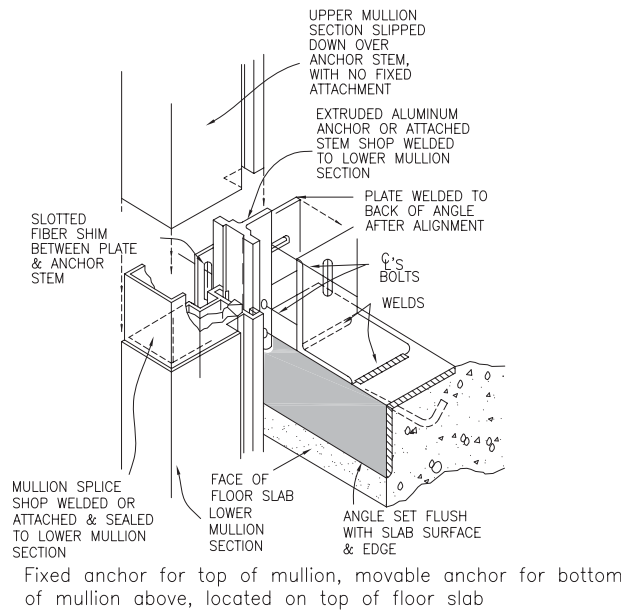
Mullion connection on top of floor slab. (Taken from Curtain Wall Design Manual, Editorial Revision: May 2005, AAMA. Used with permission, American Architectural Manufacturers Association.)
